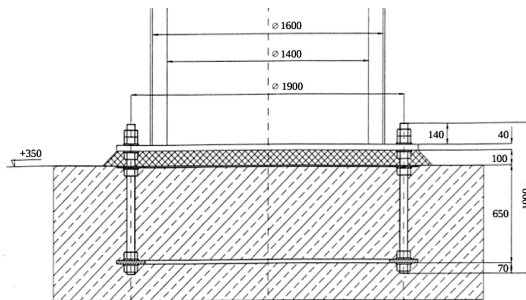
Ground plate with anchor bolts at +0.350 m (section view)
